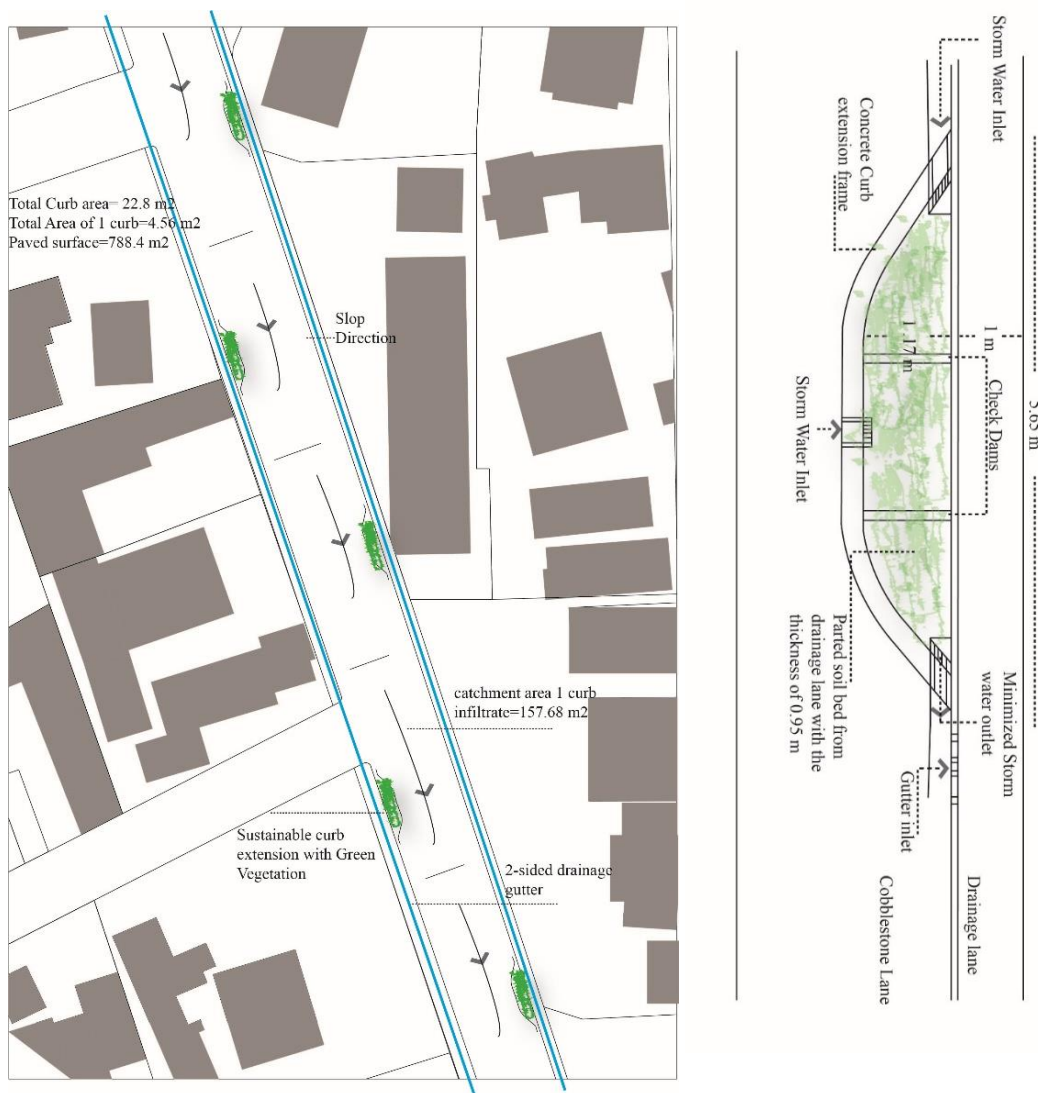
study area plan with curb extension, (left side), detailed plan layout (right side) of the designed curb extension.
